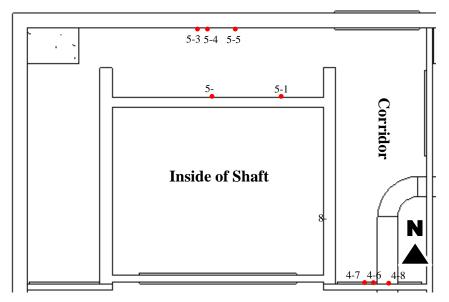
TC on S wall of corridor firestops and north of elevator shaft
